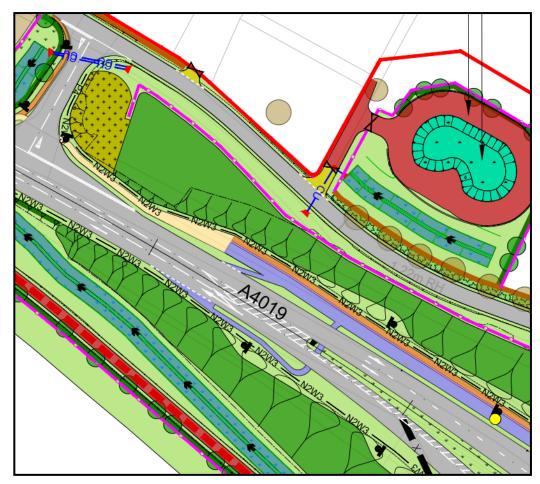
Extract of General Arrangement Plan Showing Proposed Slip/Cycle link Connections
